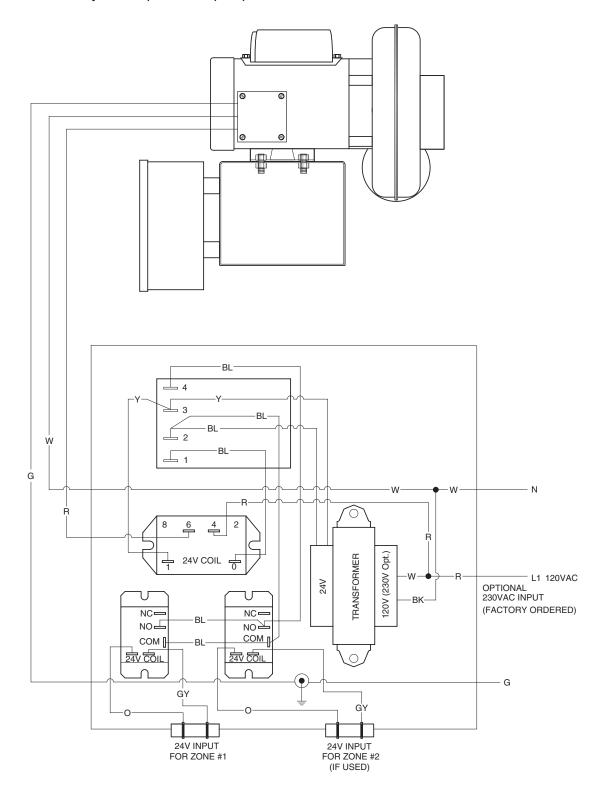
• Pump and Panel Assembly Internal Wiring
